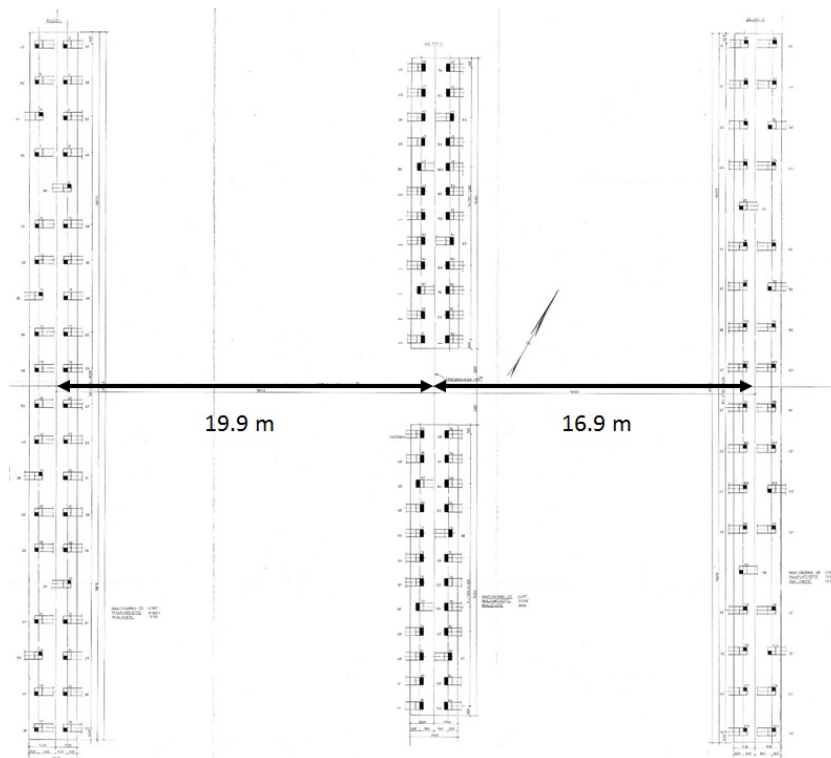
Top view of the existing pile plan of viaduct KW150 [Rijkswaterstaat, 1977b]
